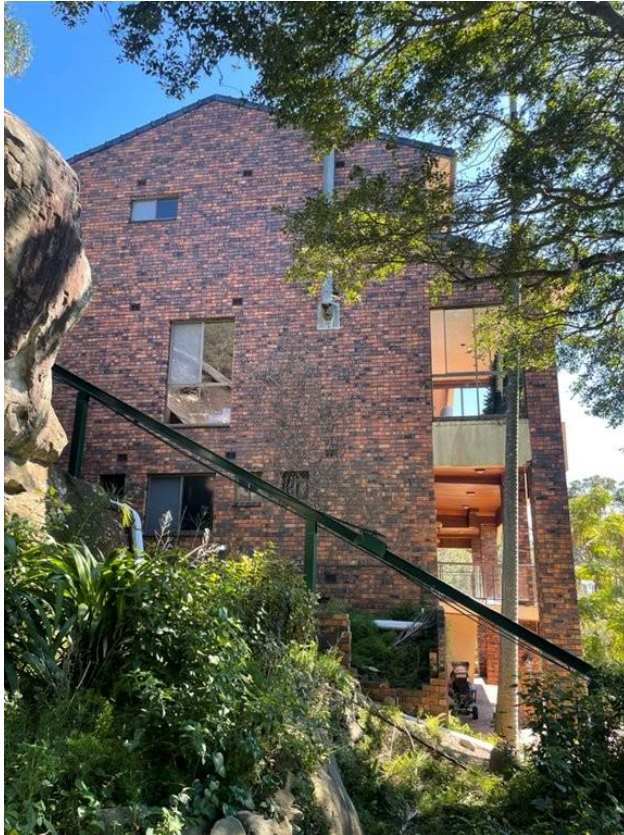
dwelling house and inclinator character at 9 Seaforth Cres adjacent to the north east
